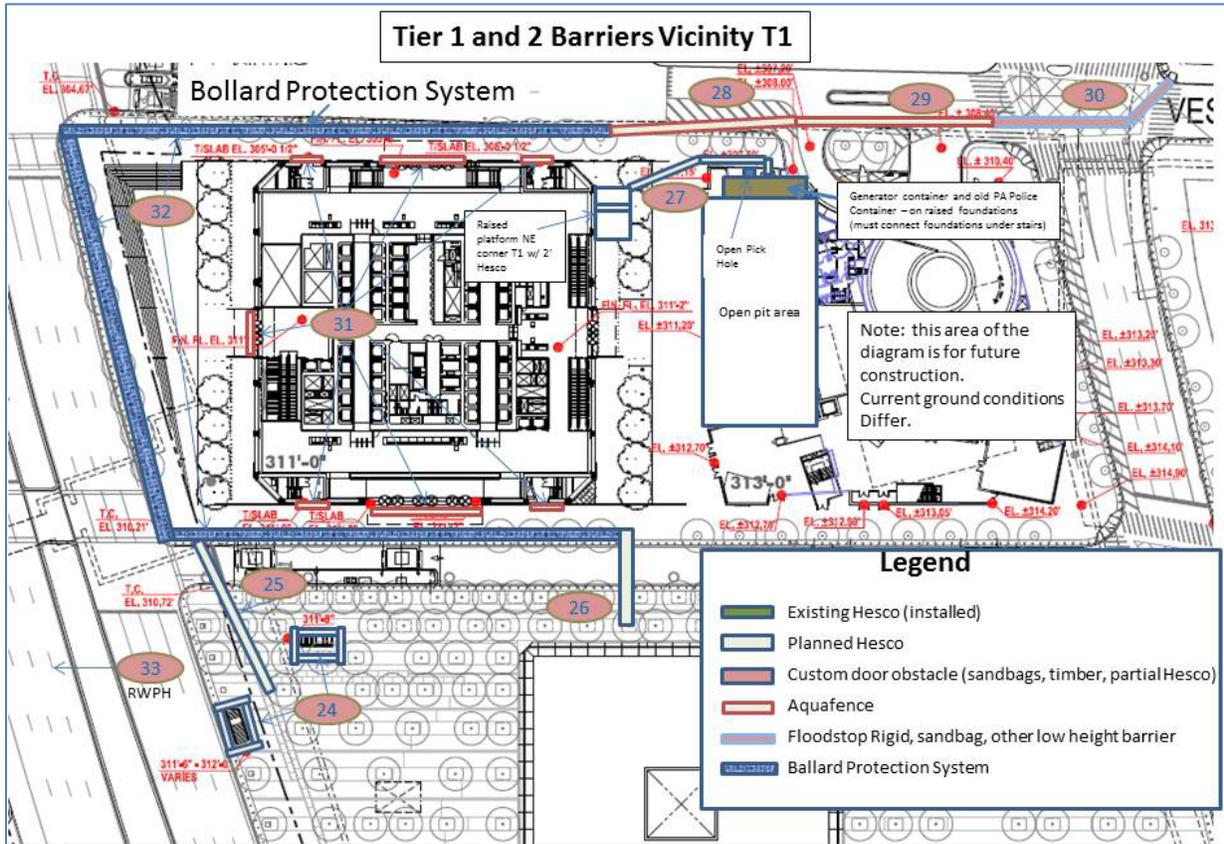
Detailed schematic of Tier 1 and Tier 2 Barrier Plan for 1WTC
